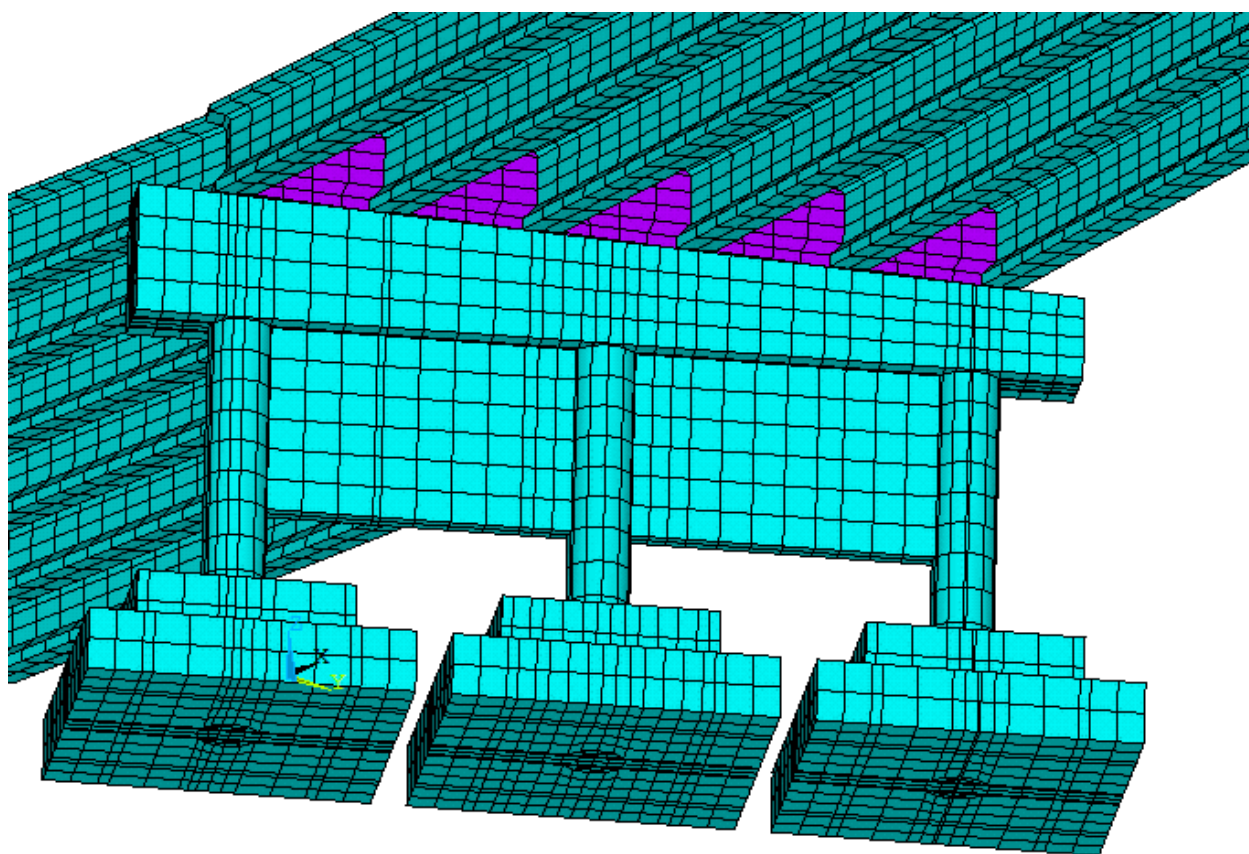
Discrete modeling of reinforced concrete diaphragms above each pier.
